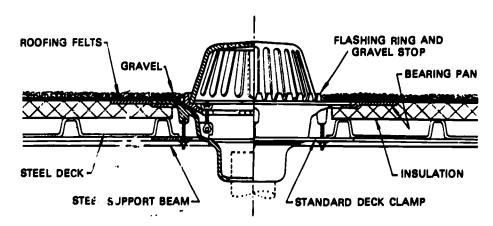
A series roof drain installed in an insulated ateal deck with built-up roofing
